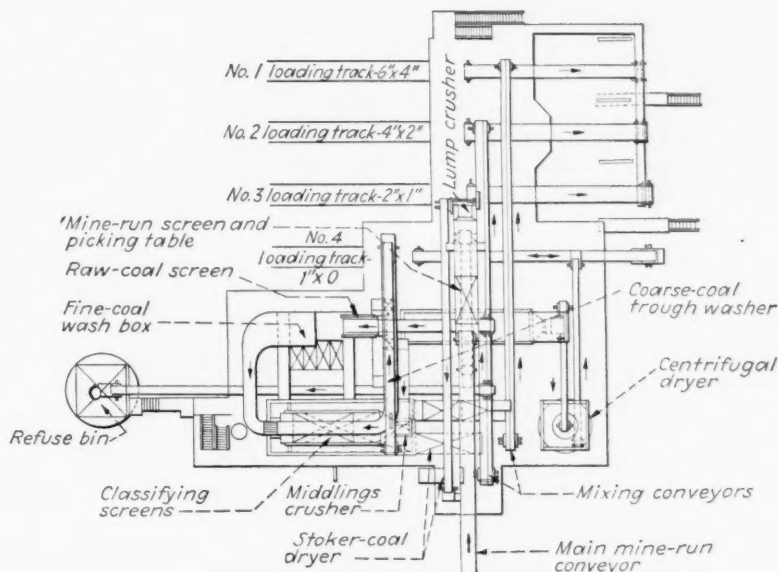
General arrangement of equipment in the Ayrdale preparation plant.
